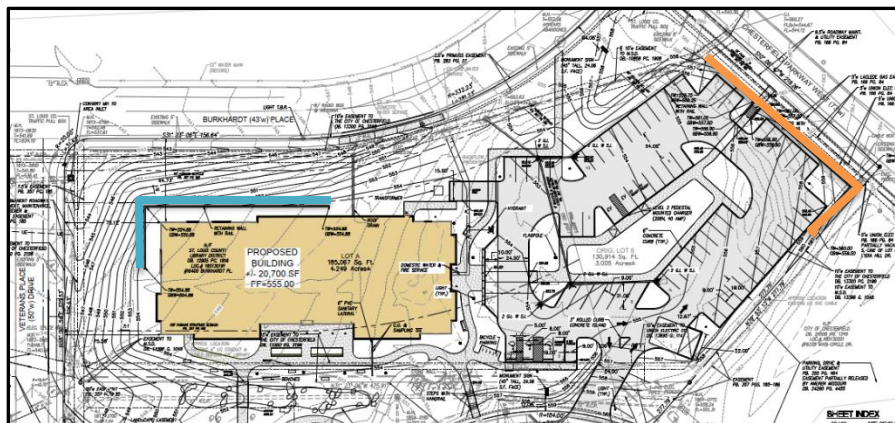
Alperstein retaining wall (Orange), Concrete retaining wall with form liner (Blue)
